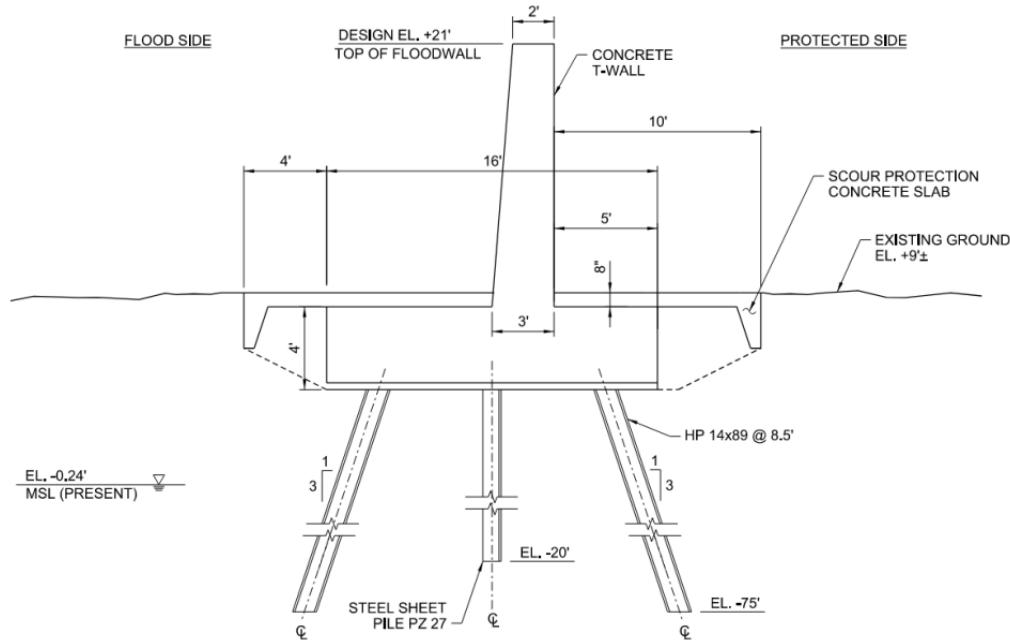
SBM Extra-Large Floodwall Cross-Section
